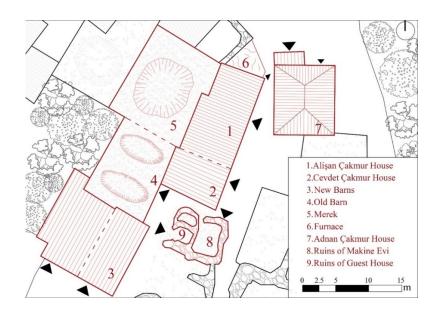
The site plan showing Çakmur Houses and surroundings (Prepared by Author, 2019).
